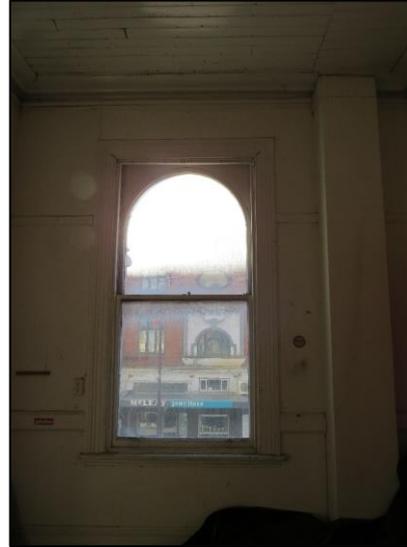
Room 27, looking north at facade W27. Note timber ceiling and cornice (possibly original), dado and picture rails. Note covered column to right of window – this is marked as “Stewarts Lift” in September 1942 plans (See Figure 5-24)
